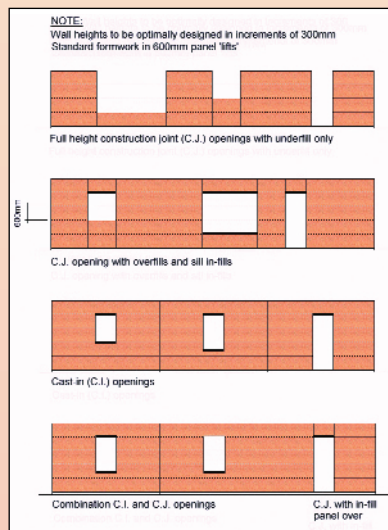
An elevation showing the configuration of typical SRE wall elements produced using the Stabilform™ system (© Affiliated Stabilised Earth Group)
